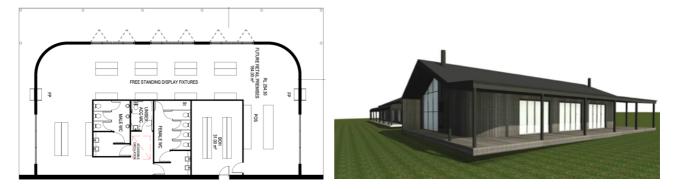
Extract from the architectural drawings showing floor plan and 3D render of Building 2
